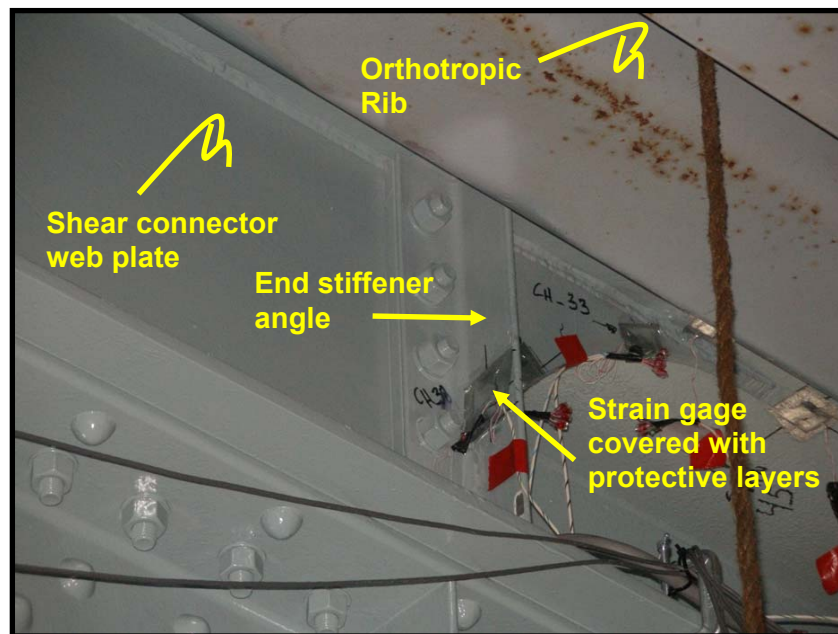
Strain gage CH_38 installed in Span 45 on the south end stiffener angle bolted to the web of the shear connector at the north end of the span over the east girder (at mid height of the stiffener and mid width of the outstanding leg) (view looking east)
